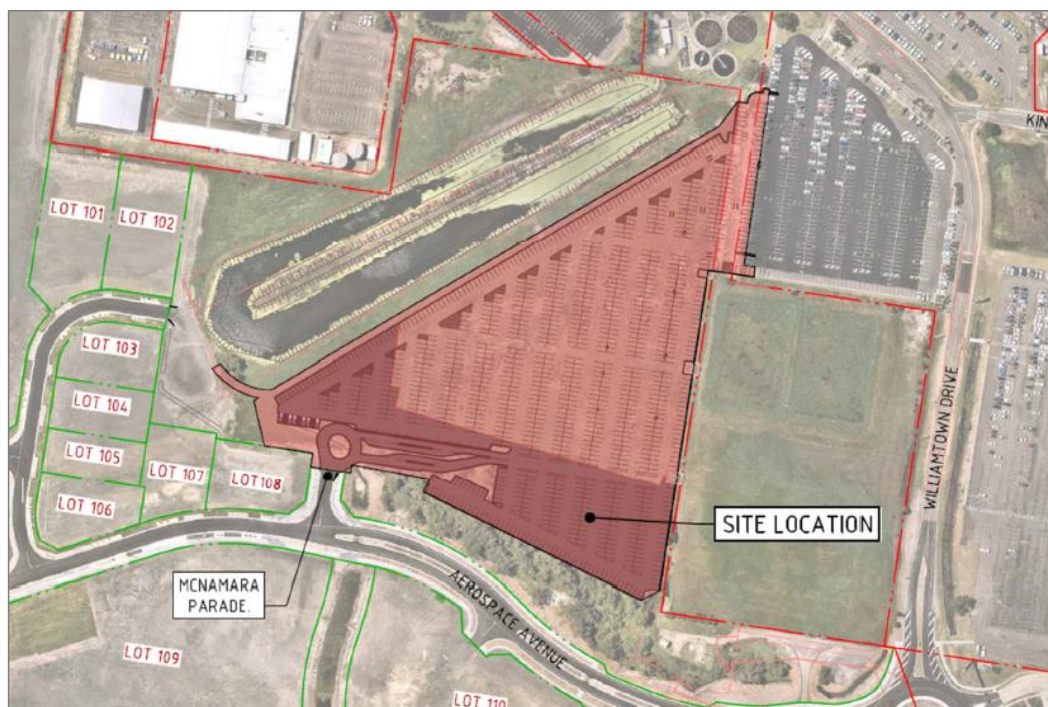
Site Plan of Proposed Car Park Extension (Extension shown in dark red)
